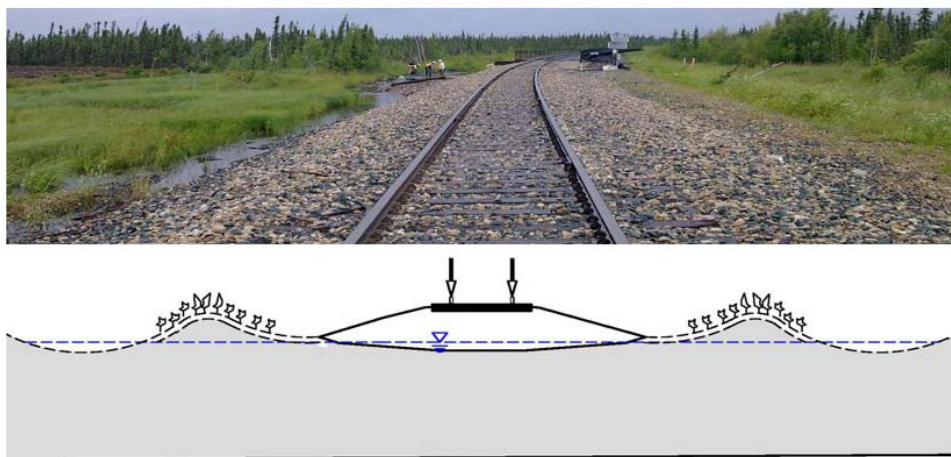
(Top) Section of existing railway embankment near Anzac, Alberta, Canada, (Bottom) proposed section for the construction of new railway embankment or to reinforce the existing embankment in peat lands.
